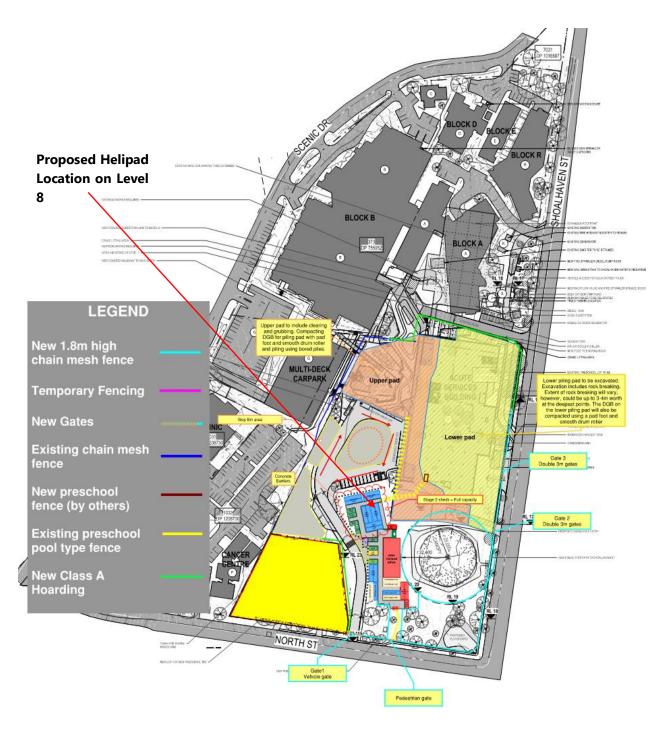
Site Plan of Proposed Development (Refer also – Appendix B)
